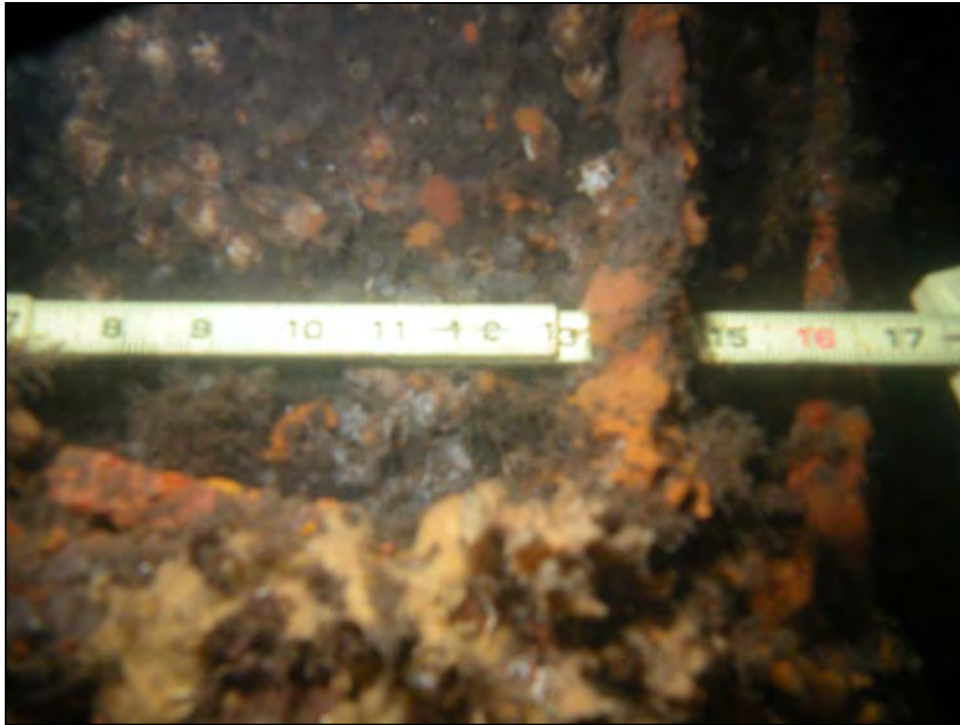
Typical view of the exposed steel reinforcement cage at the location of the missing concrete pile jacket. (Photo by Childs Engineering Corp.)
